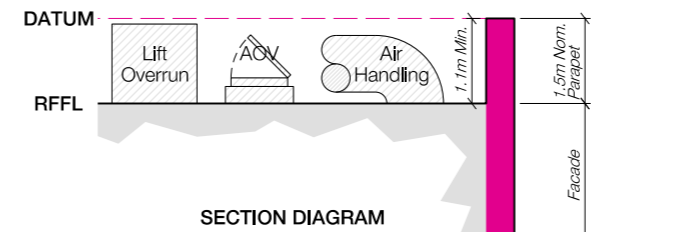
Rooftop plant concealed below parapet datum.
